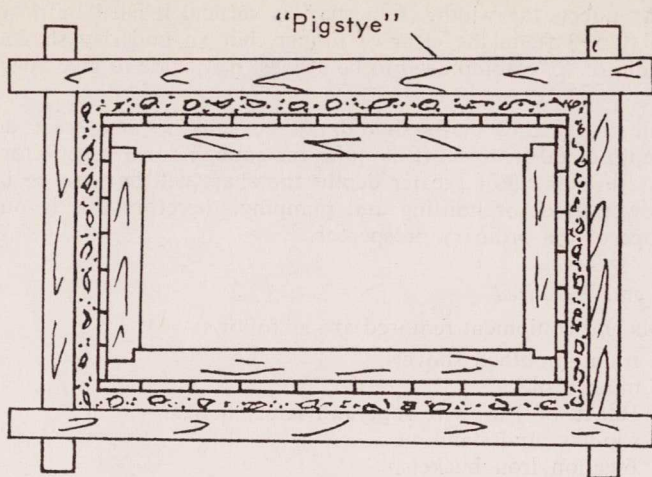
Plan of shaft showing shaft timber being brought up through "pigstye".
